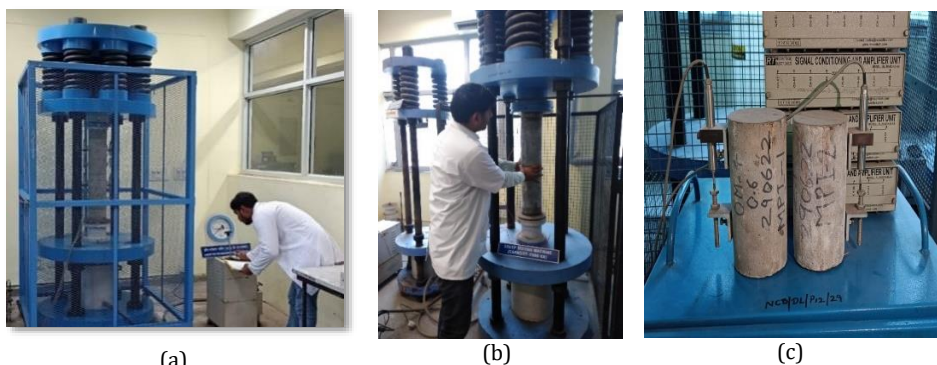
Creep Testing Arrangement (a) creep testing rig 1500 kn capacity, (b) loaded specimen, and (c) shrinkage specimen
